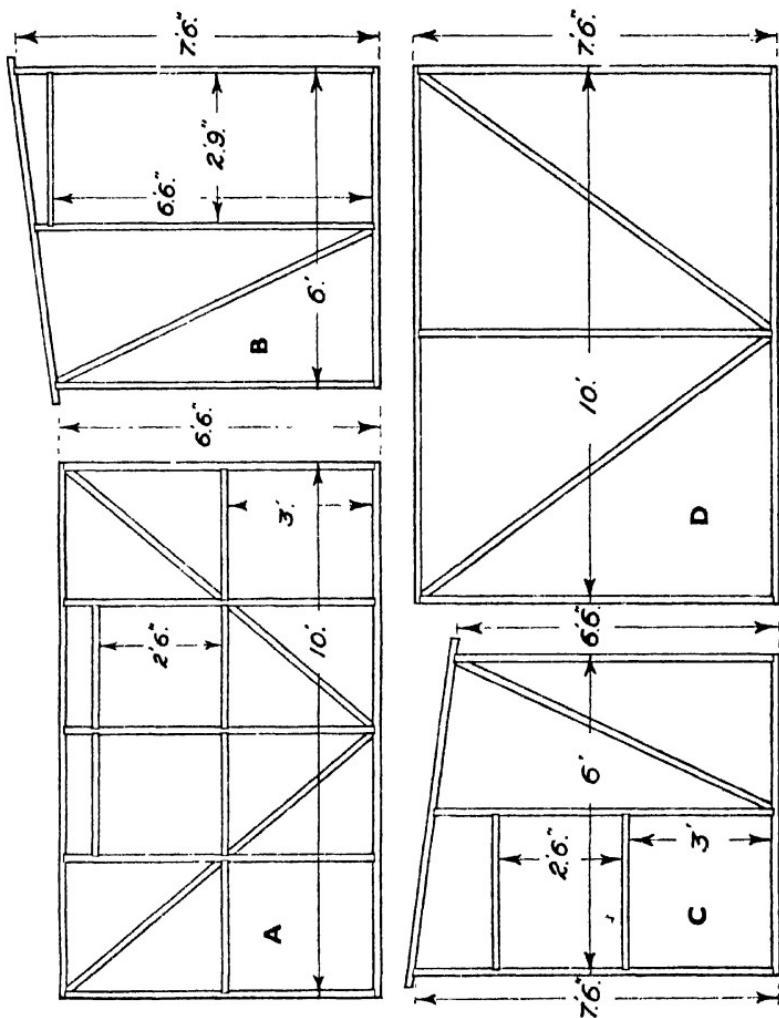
ELEVATIONS WITH SIZES OF THE MAIN FRAMES.
